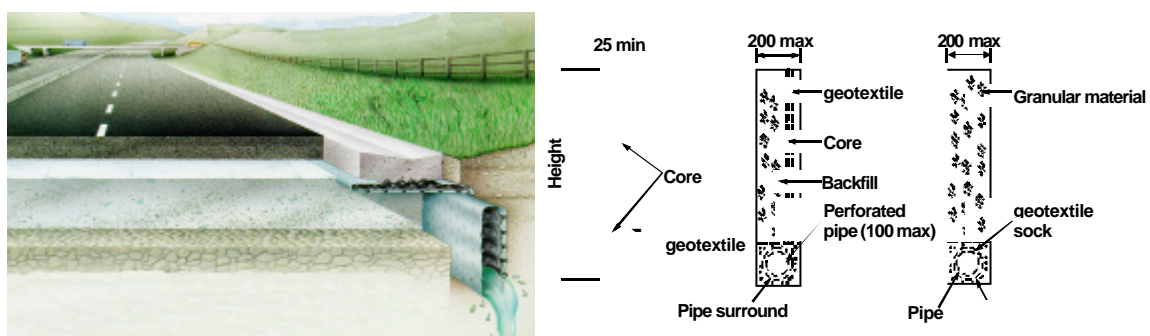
A three-dimensional artist's impression of how sub-surface drainage work and construction details of Fin and Narrow Filter drains.
